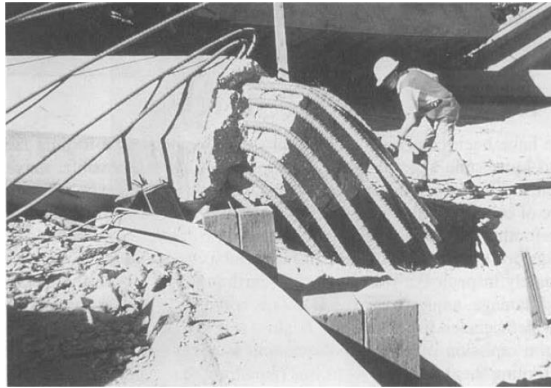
Column failure due to longitudinal reinforcement pullout in the 1971 San Fernando Earthquake
